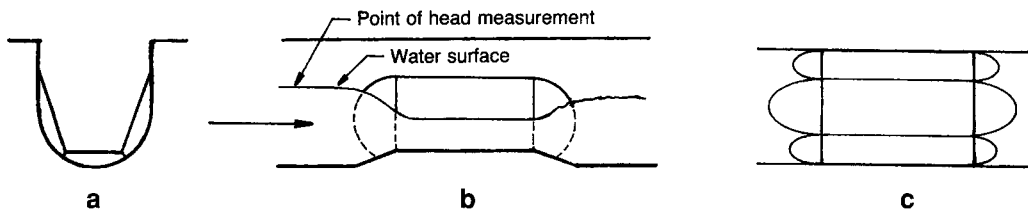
Palmer-Bowlus flume. (a) Cross-section; (b) longitudinal section; (c) plan.
